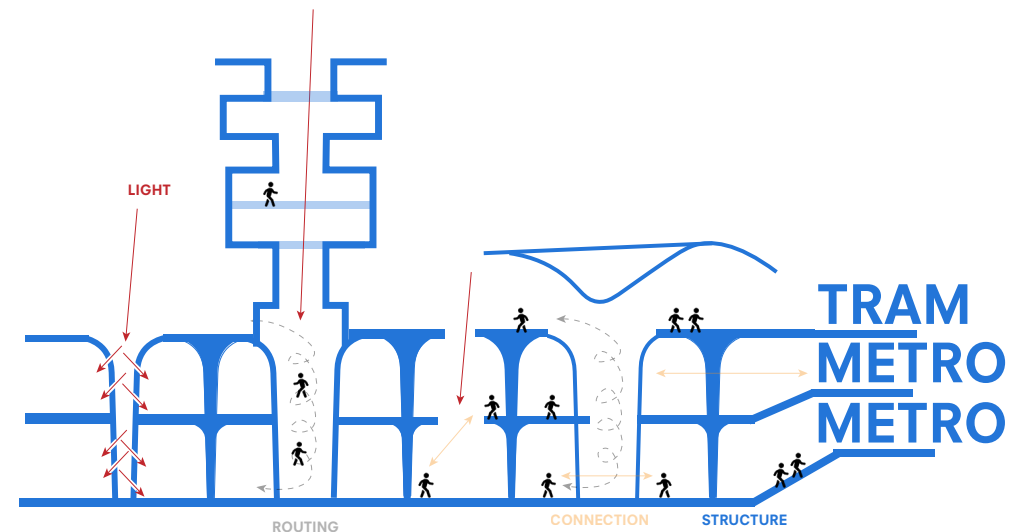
Integral concept columns: routing, construction, connection, daylight & transport
